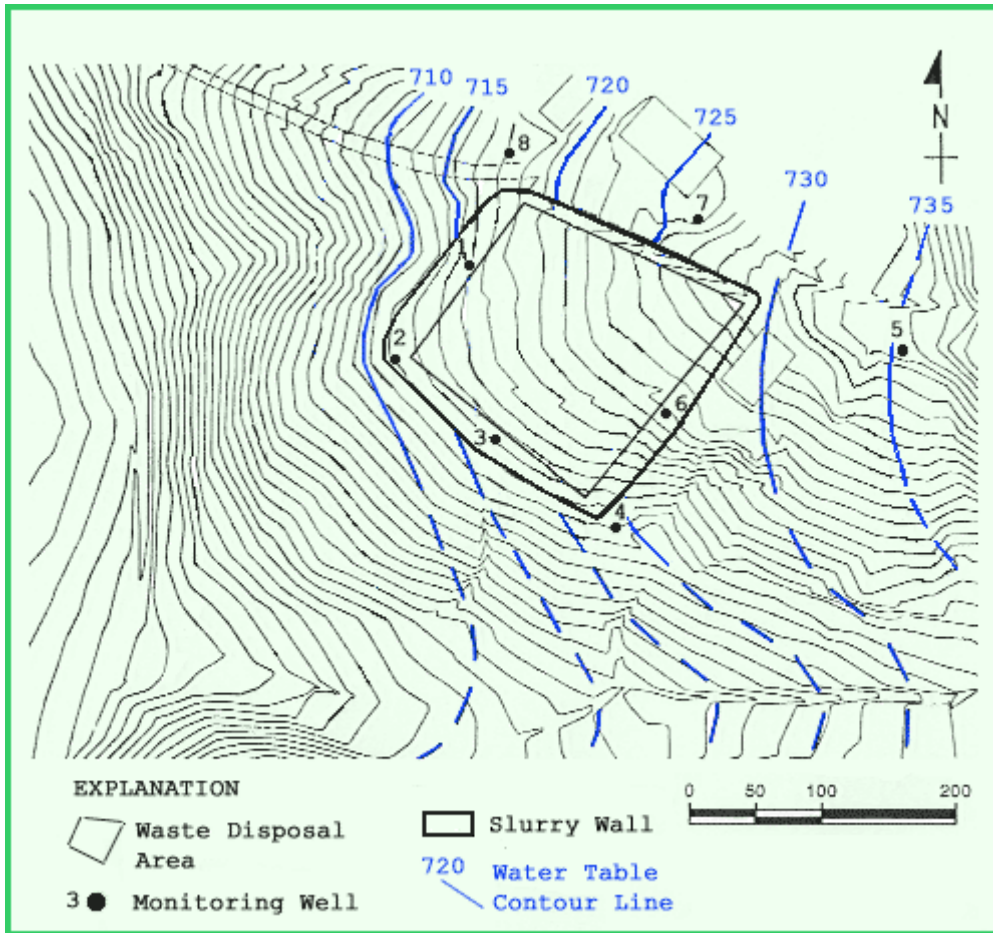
Plan view of a Slurry Wall surrounding the waste disposal area
